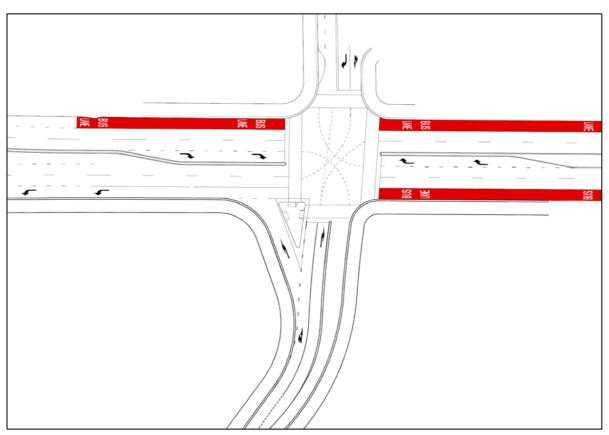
Proposed changes at the intersection of Herring Road and Ivanhoe Place
